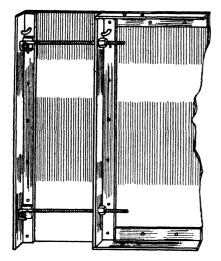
Adjustable "metaform" Unit for concrete construction
